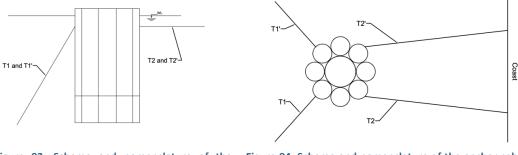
Scheme and nomenclature of the anchor cables anchor cables front view plan view
